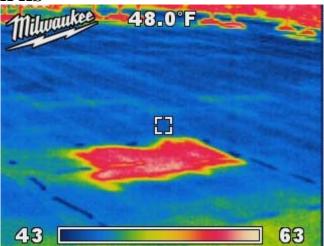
IR Photo of suspect wet area. Centered on Roof Sector A9.
